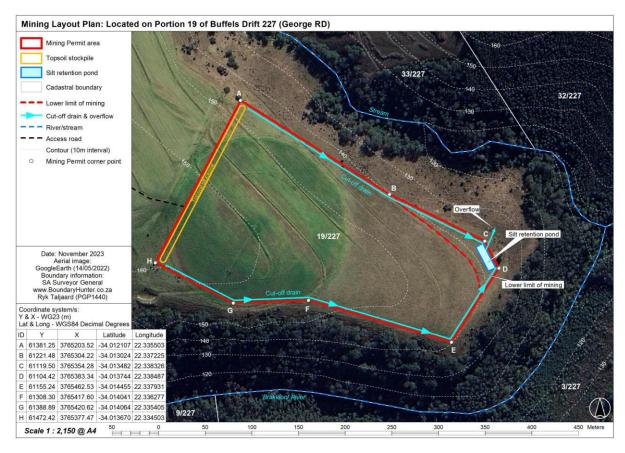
Mining layout plan showing the proposed stormwater management, provided by Klipberg Consulting (2023)
